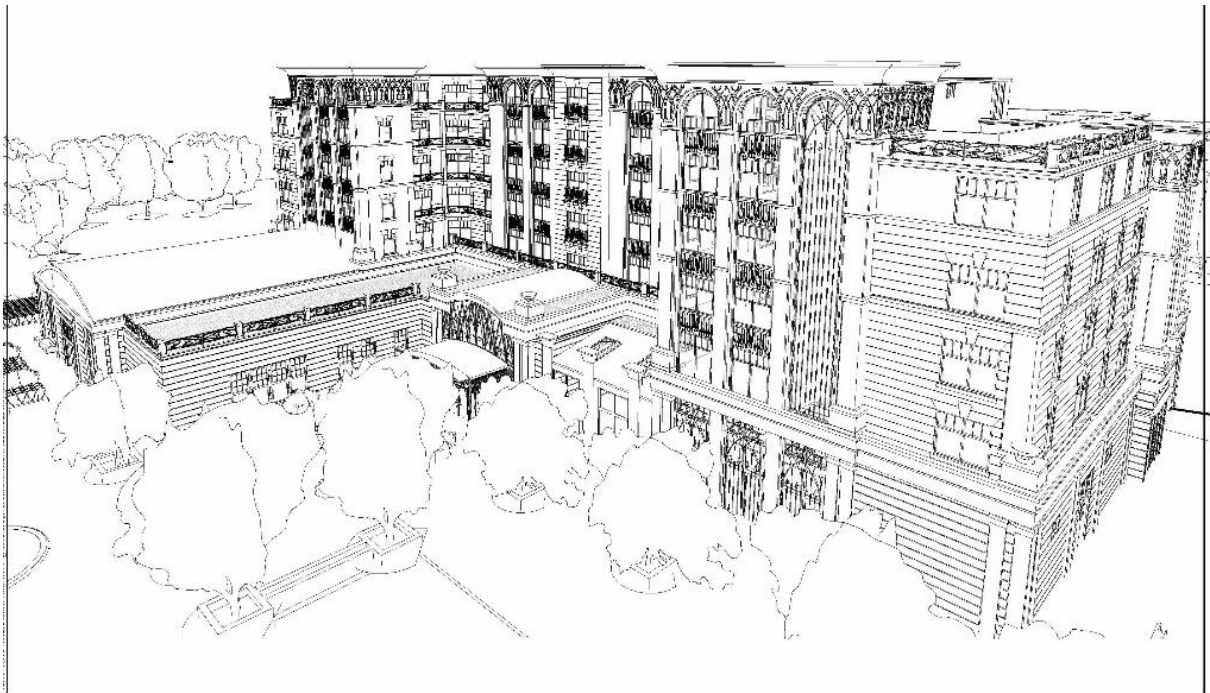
example detailed north elevation showing line and pattern form for the proposed hotel
